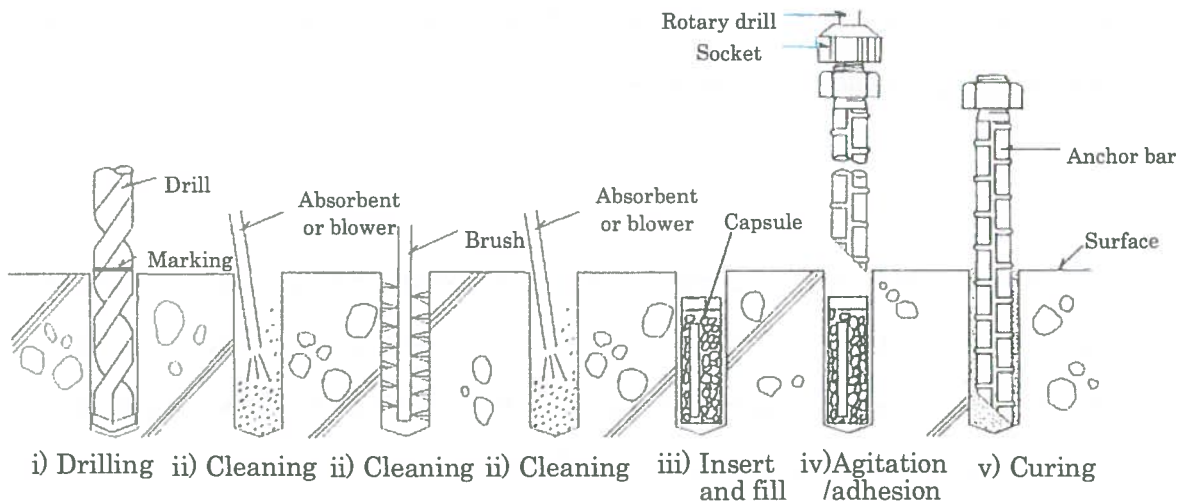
The Standard Procedure of Post-Installed Anchor Work
